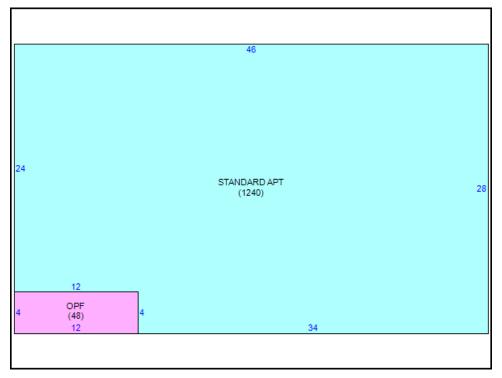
Standard single-unit apartment plan (Leon County Property Appraiser 2020).
